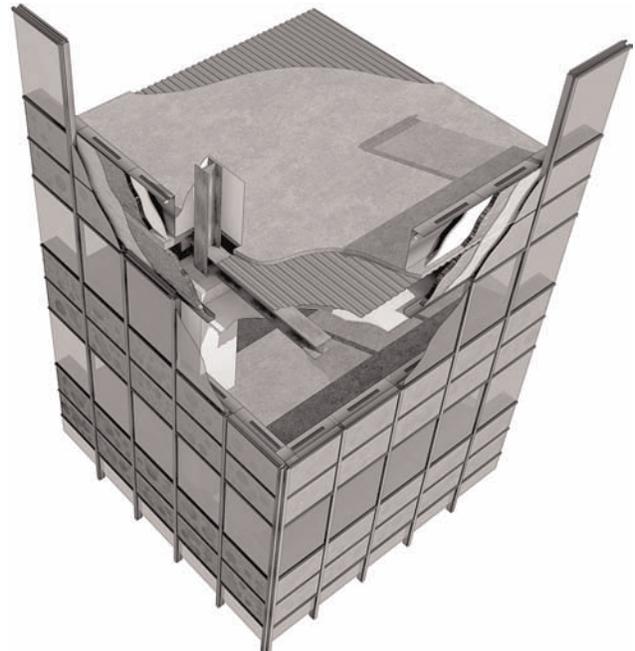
Pietro Belluschi, Equitable Building, Portland, Oregon, 1948, digital reconstruction of cladding (image by the authors).
